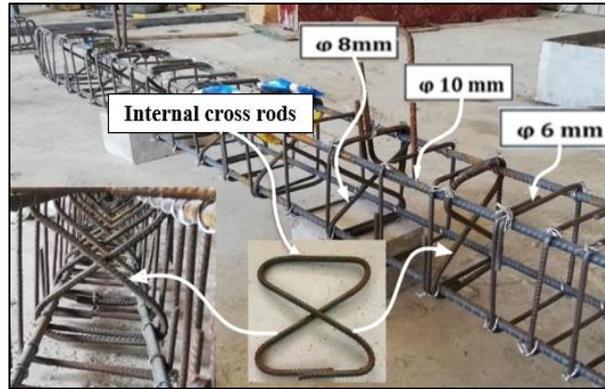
Internal cross rod of steel bracing and steel bars reinforcement
